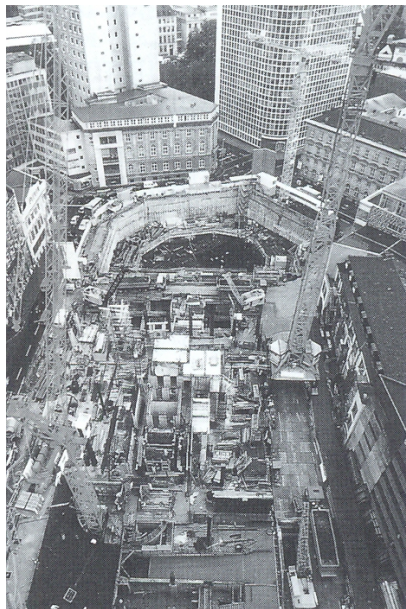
Site organisation for the Main Tower in Frankfurt, Germany
